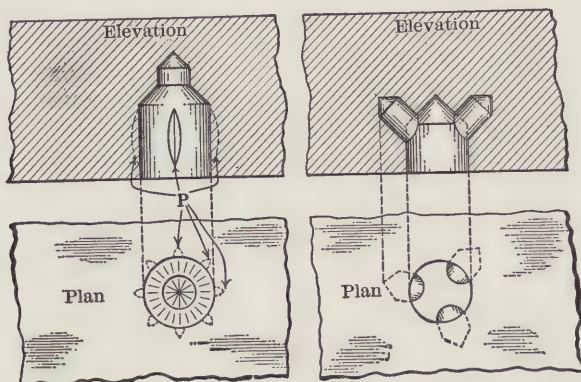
DETAILS OF ANCHOR SCREWS AND BOLT HOLES
